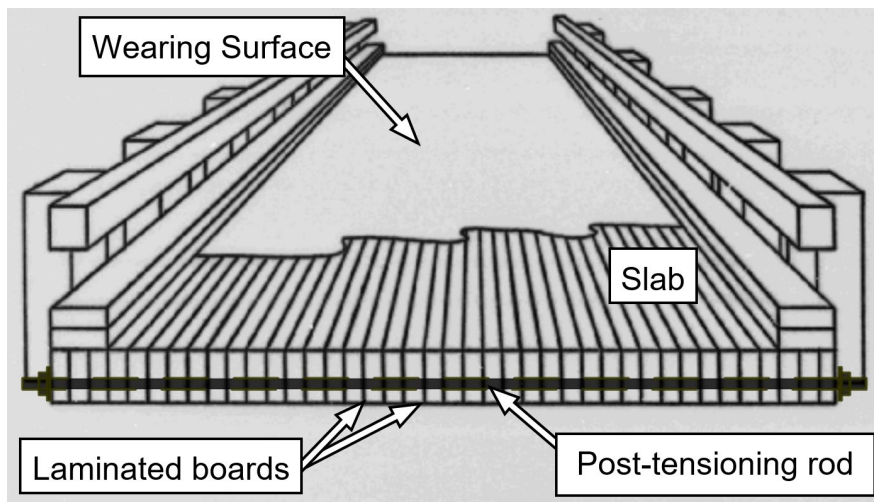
Typical Section of a Stress-Laminated Timber Slab Bridge
